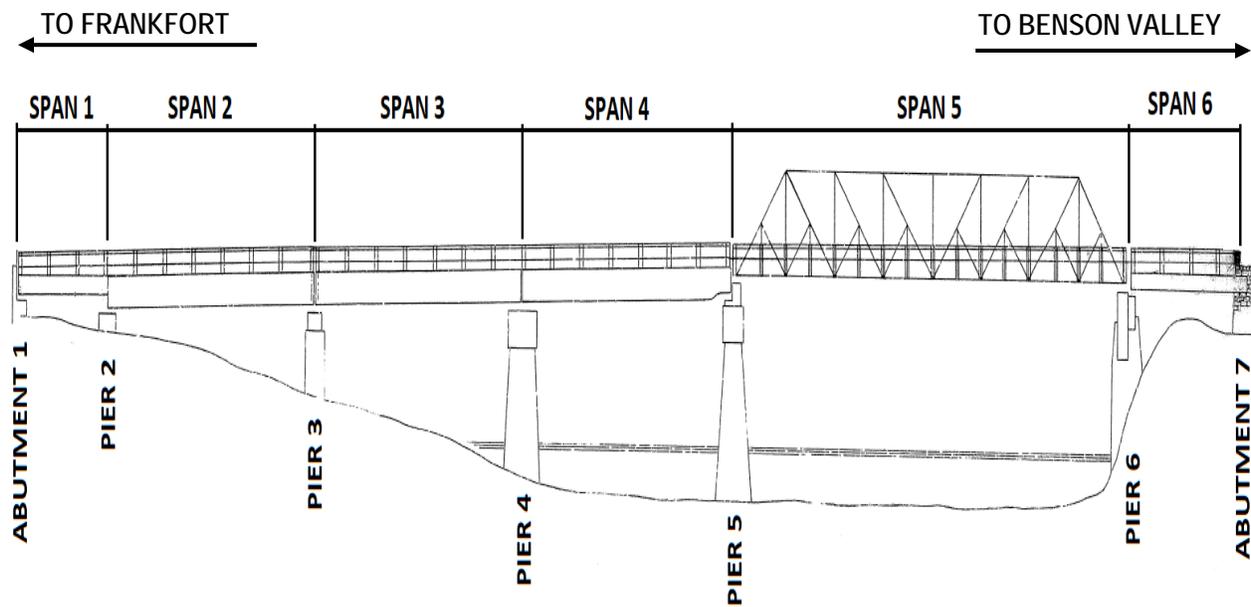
Elevation of the Broadway Bridge with span and substructure numbering.
